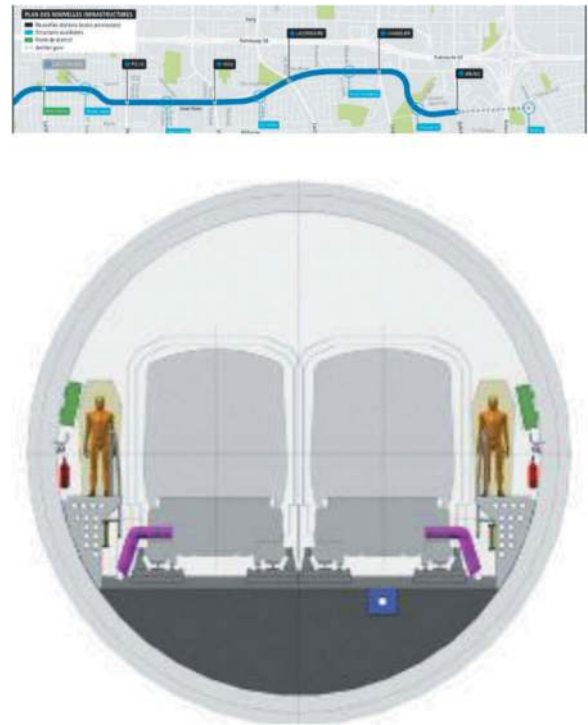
Layout of the tunnel, underground stations, auxiliary structures, and the tunnel section.
